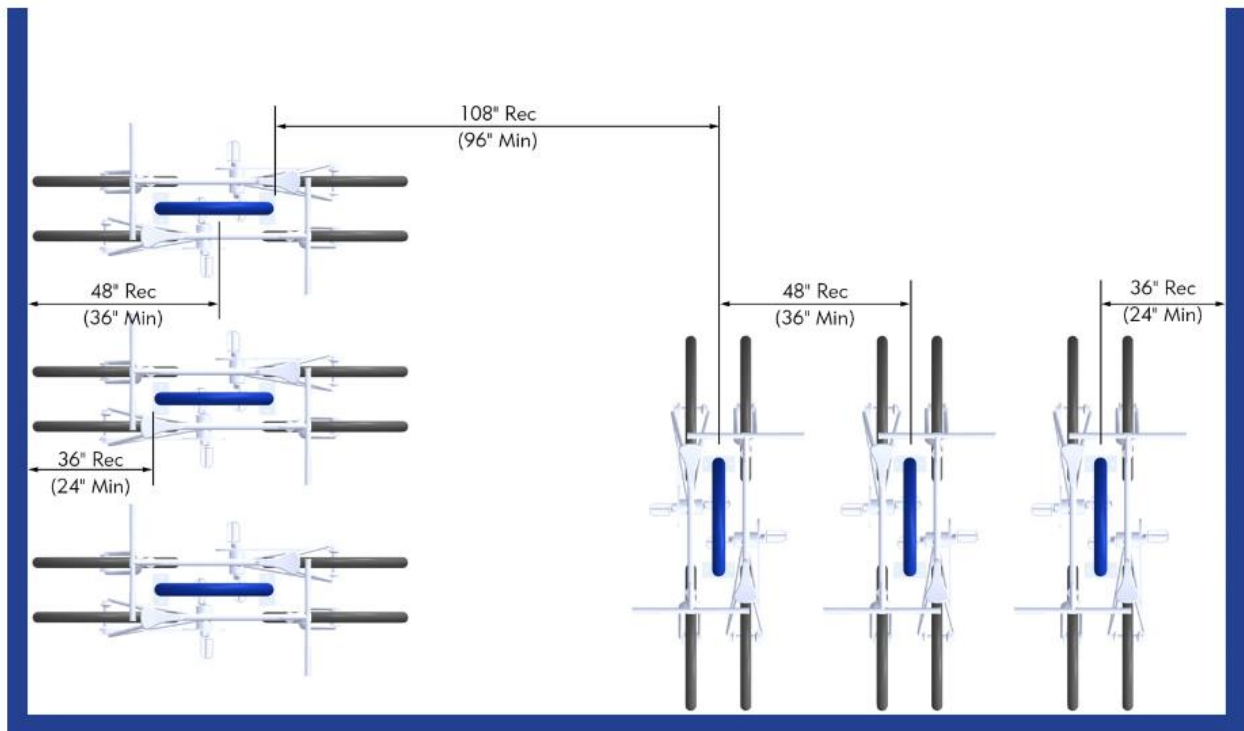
Bike Parking Lot Layout with Min. and Rec. dimensions (Bike Parking Guide ).
